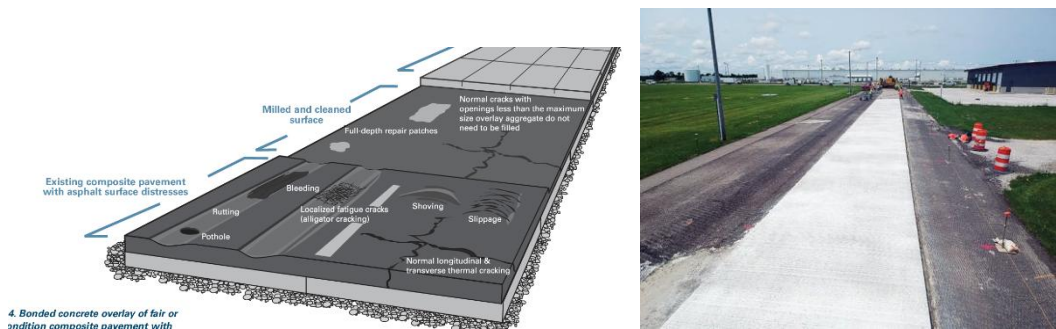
Bonded concrete overlay applications (adapted from guide to concrete overlays, 2012)
